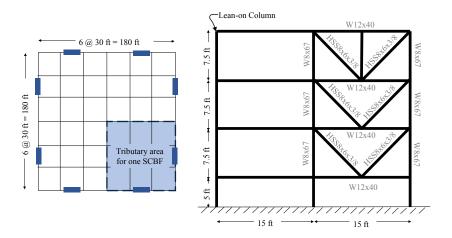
Structure model (a plane view of prototype building) and details of SCBF frames.
